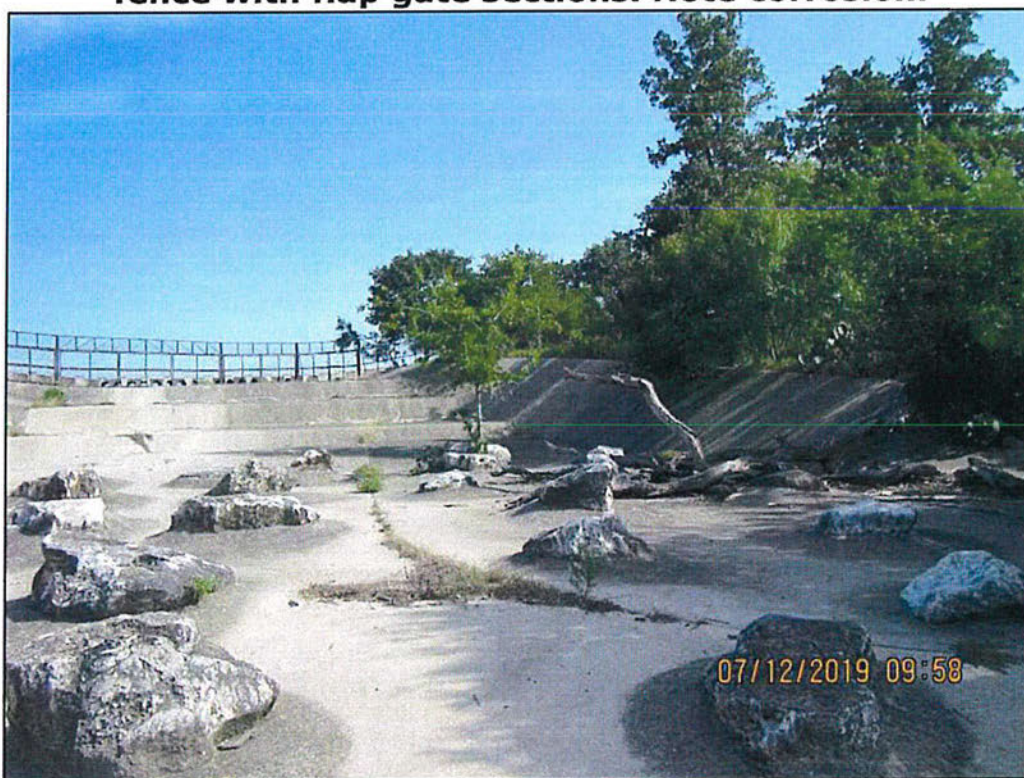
Service spillway. Looking upstream. Note vegetation.
